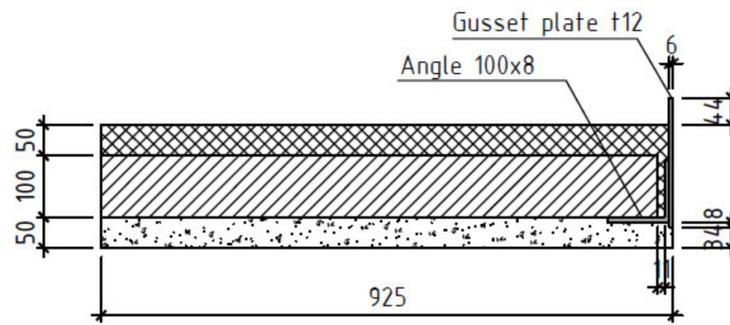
Calculation scheme with a gusset plate. The gaps between the angles and precast reinforced concrete elements are filled with thermal insulation (units: mm).
